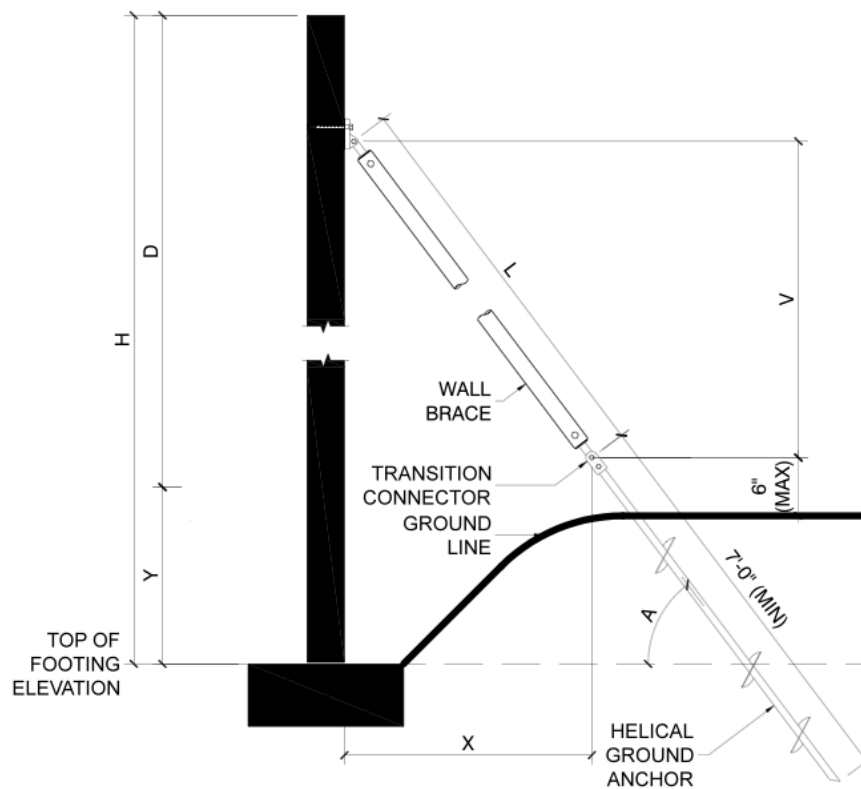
Section Cut of Tilt-Up Concrete Panel with Helical Ground Anchor (Reproduced from Steinbicker, 2018)
